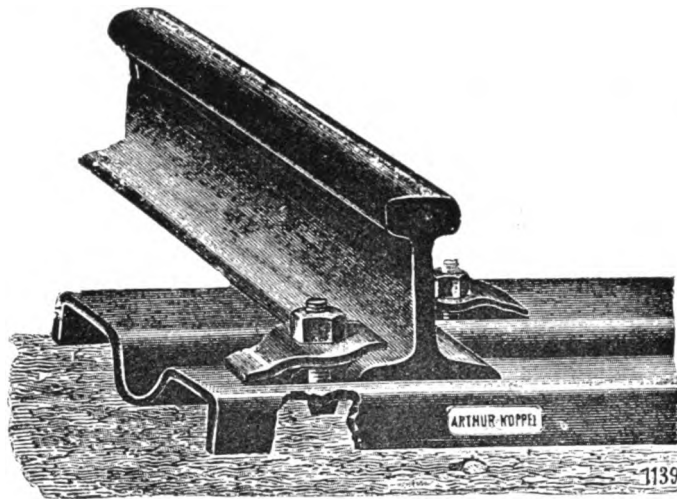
CLIP AND BOLT FASTENING FOR ATTACHING RAILS TO SLEEPERS.
